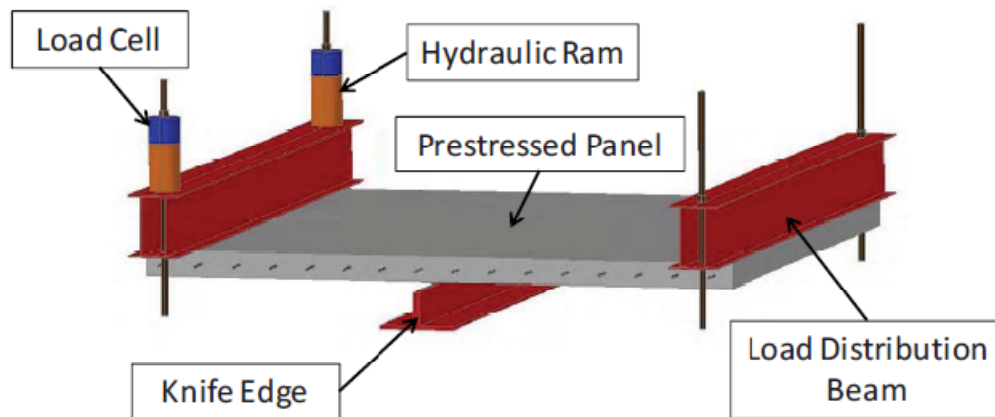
Setup with Knife-Edge Support, used to Generate Collinear Cracks and Measure Prestress Loss
